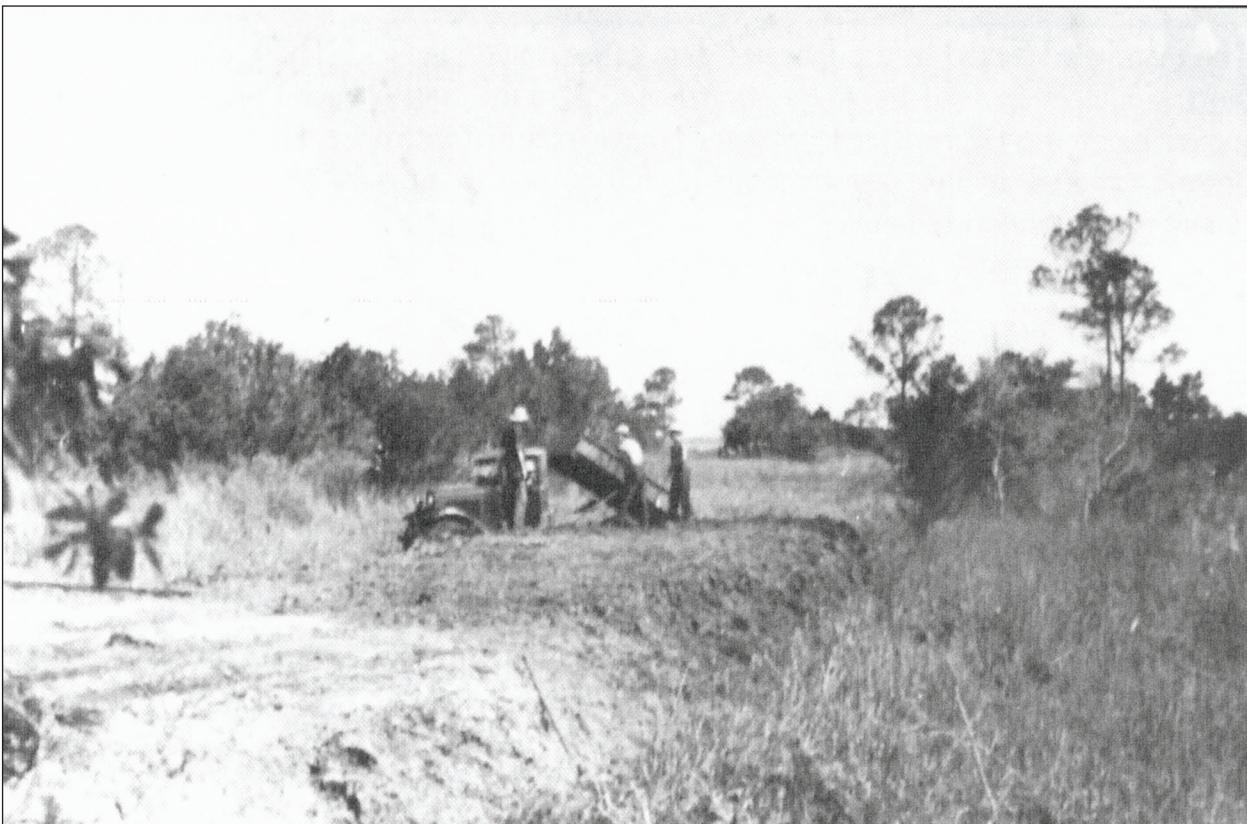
Views of the CCC crew constructing portions of the causeway between Hunting Island and St. Helena Island (from Cole 1997:57).
